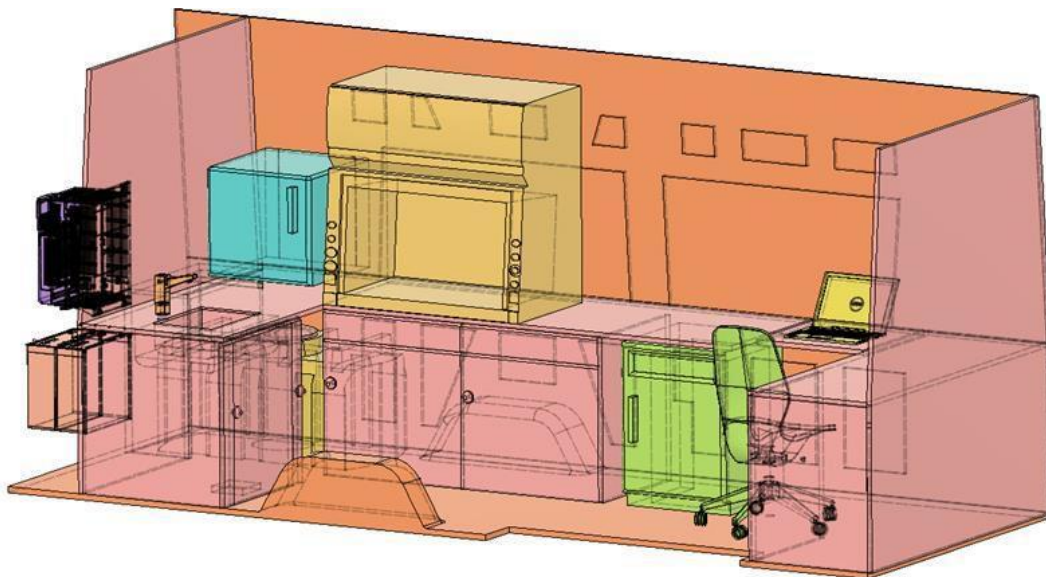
The layout of the Model 1 mobile laboratory floor plan showing elevations, as produced by CSIR Smart Places.
